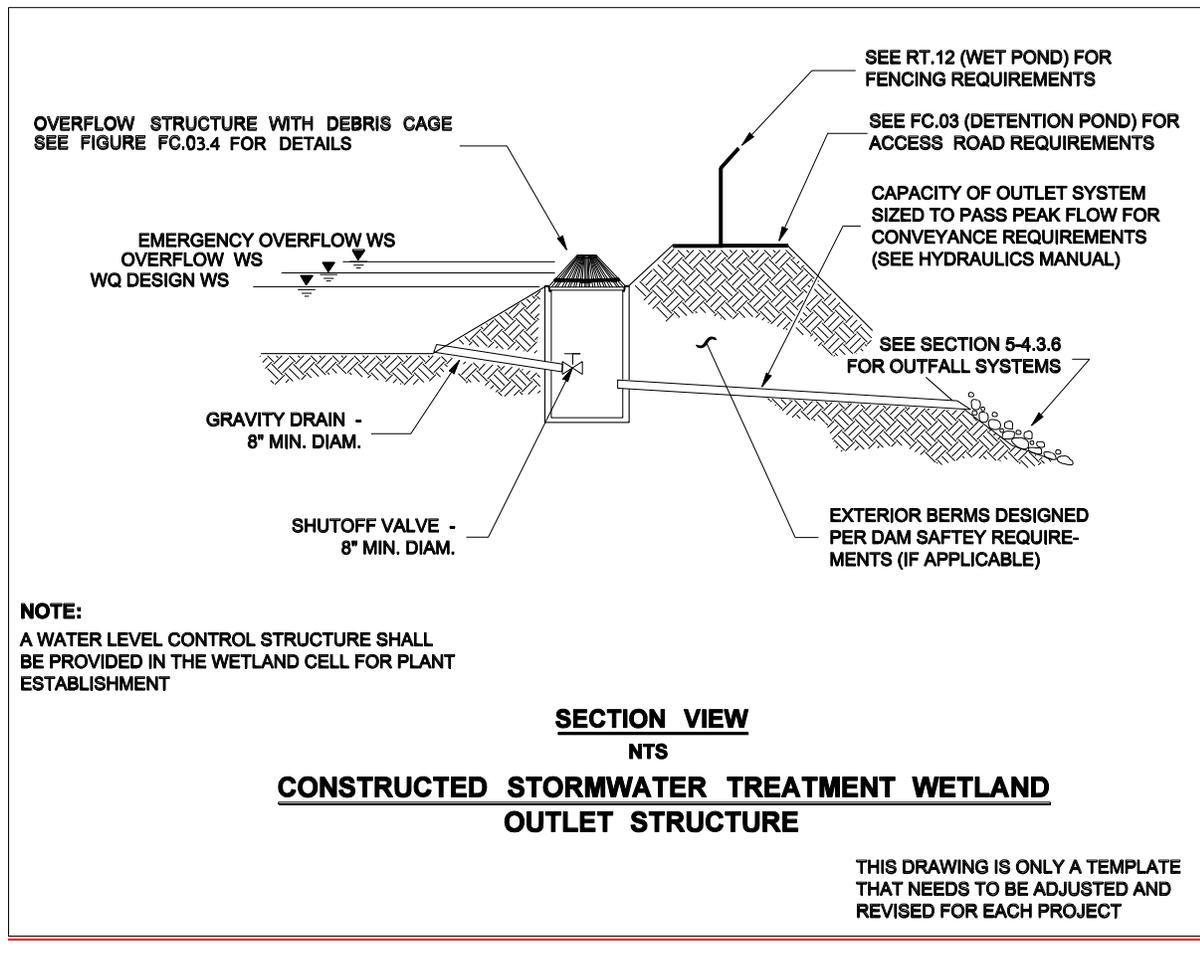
Constructed stormwater treatment wetland outlet structure.
